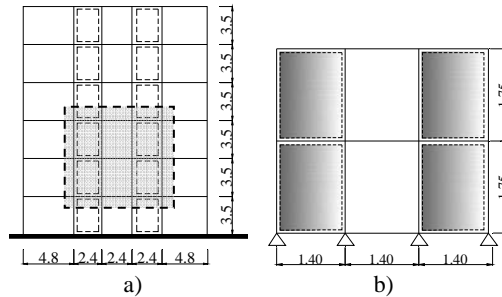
Six story model used for extracting the test specimens a) and two story half-scale specimen b).
